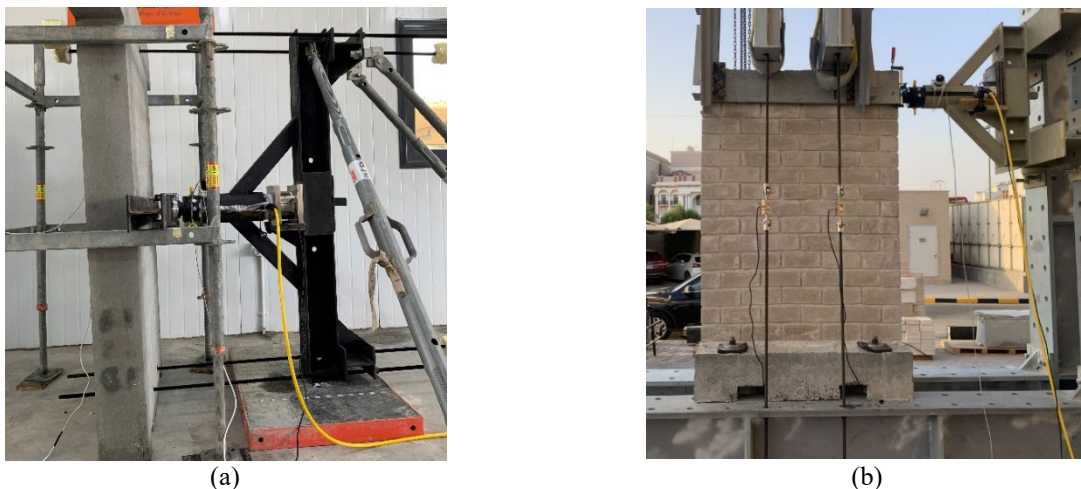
(a) The out-of-plane test setup and (b) the in-plane test setup of the CEB walls.
